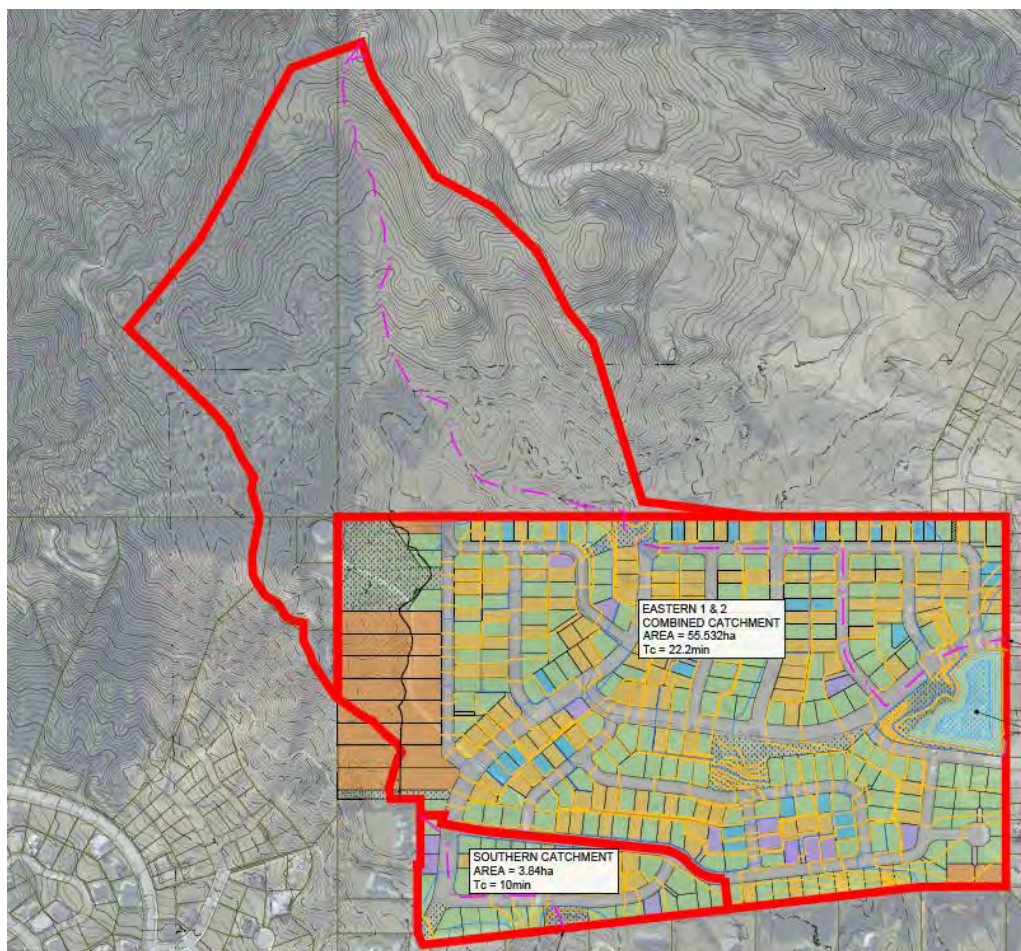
Proposed stormwater drainage catchments (Attachment B Rileys' Report).
